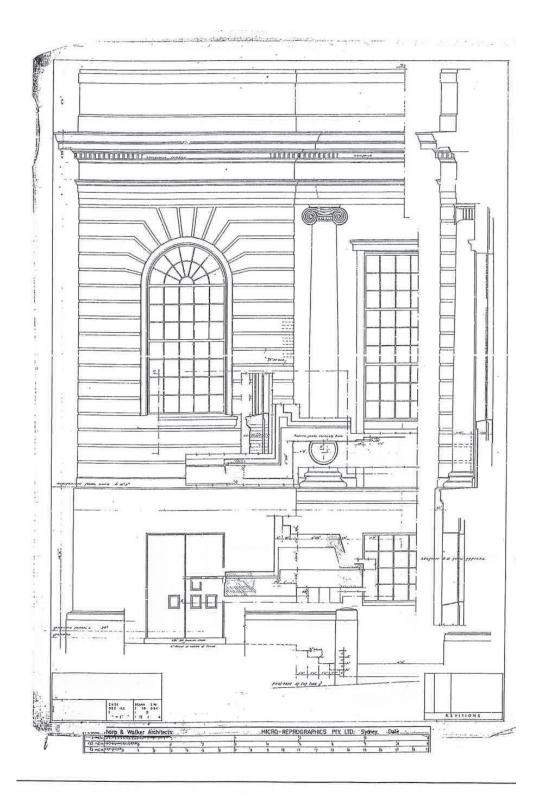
Details, 1926, (Source: Conservation Plan 2000)
